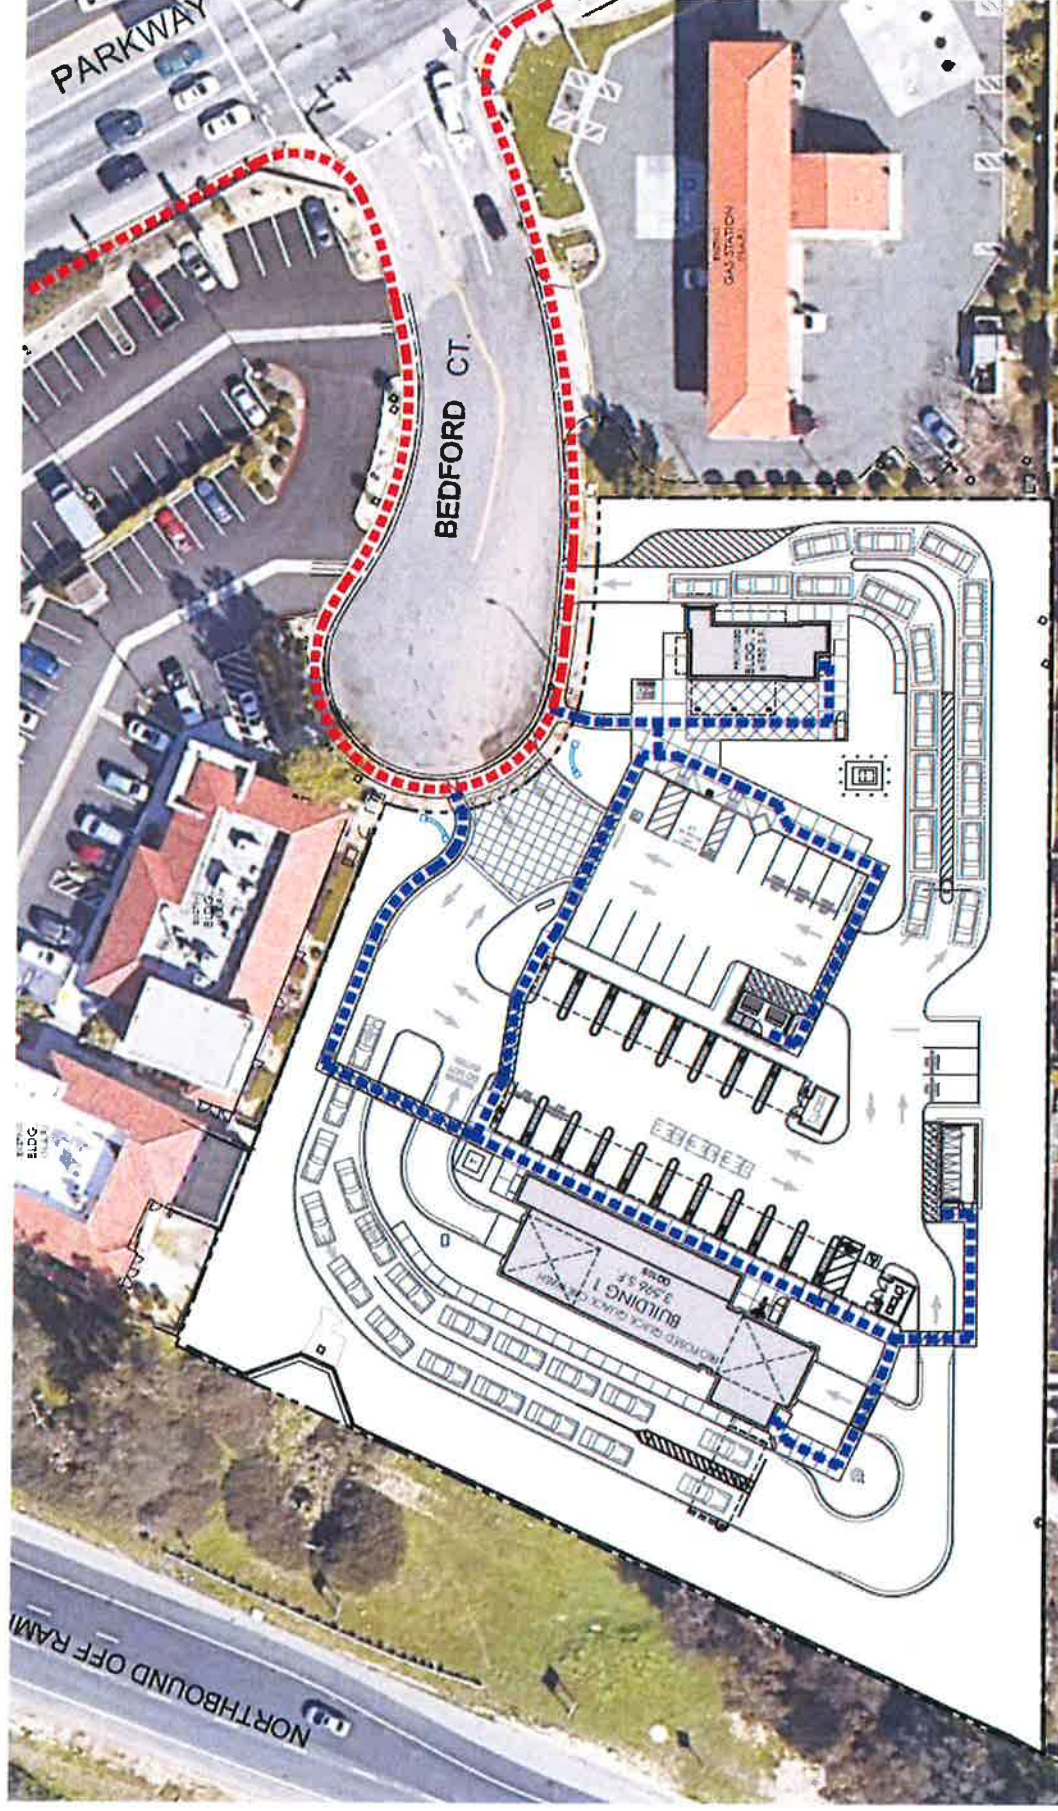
WALKWAYS AND PEDESTRIAN LINKAGES PLAN
